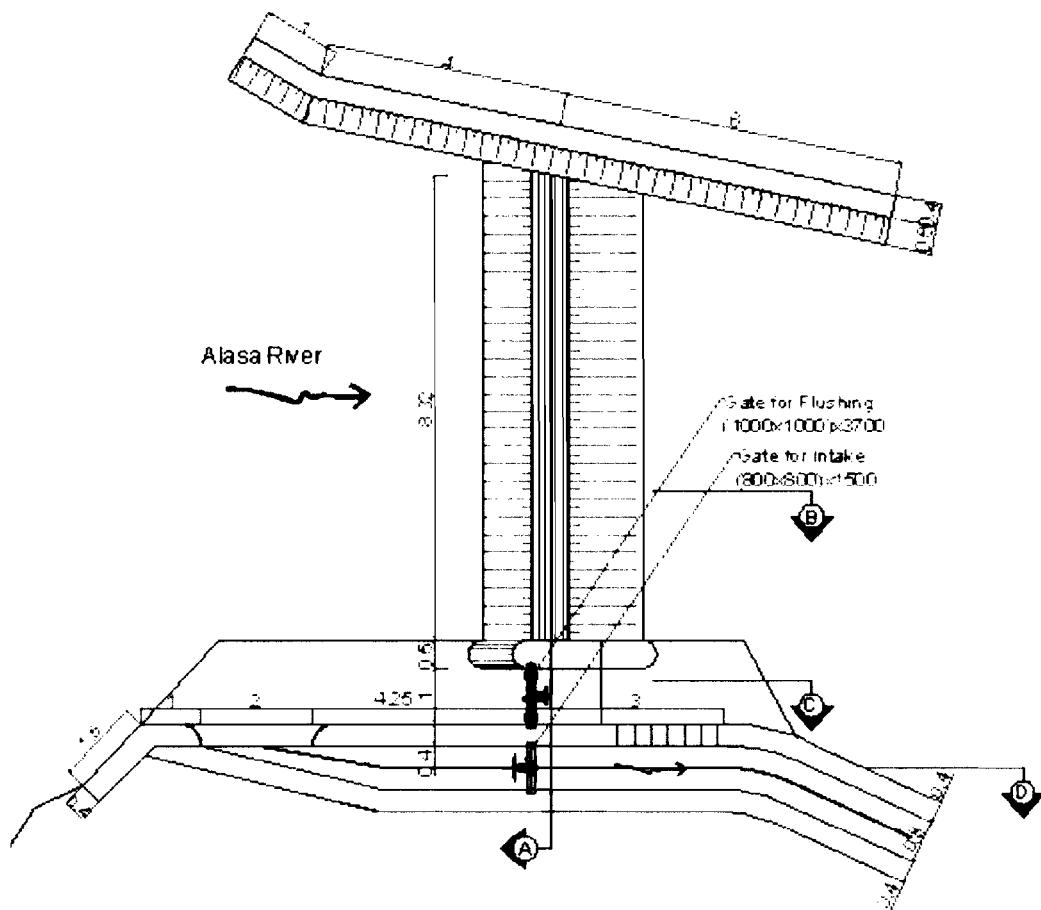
Layout of Weir & Intake structures at the Alasa river
